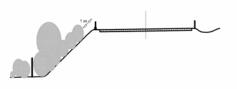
Cross section of the road on an embankment with concrete safety fence with presented width of mowing.
